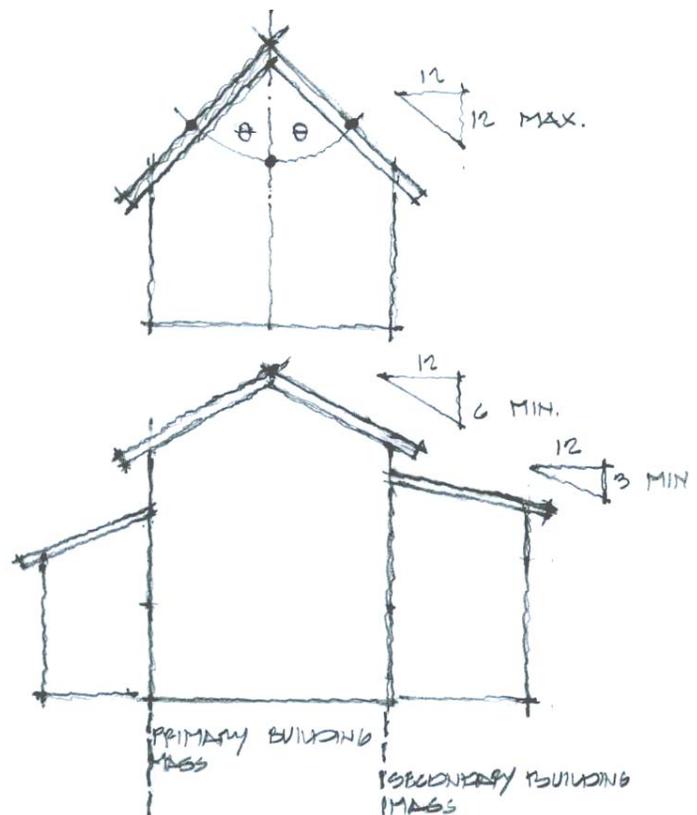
Pitched roof forms shall have a slope of between 6/12 and 12/12. Shed roof forms shall have a slope of between 3/12 and 12/12.
